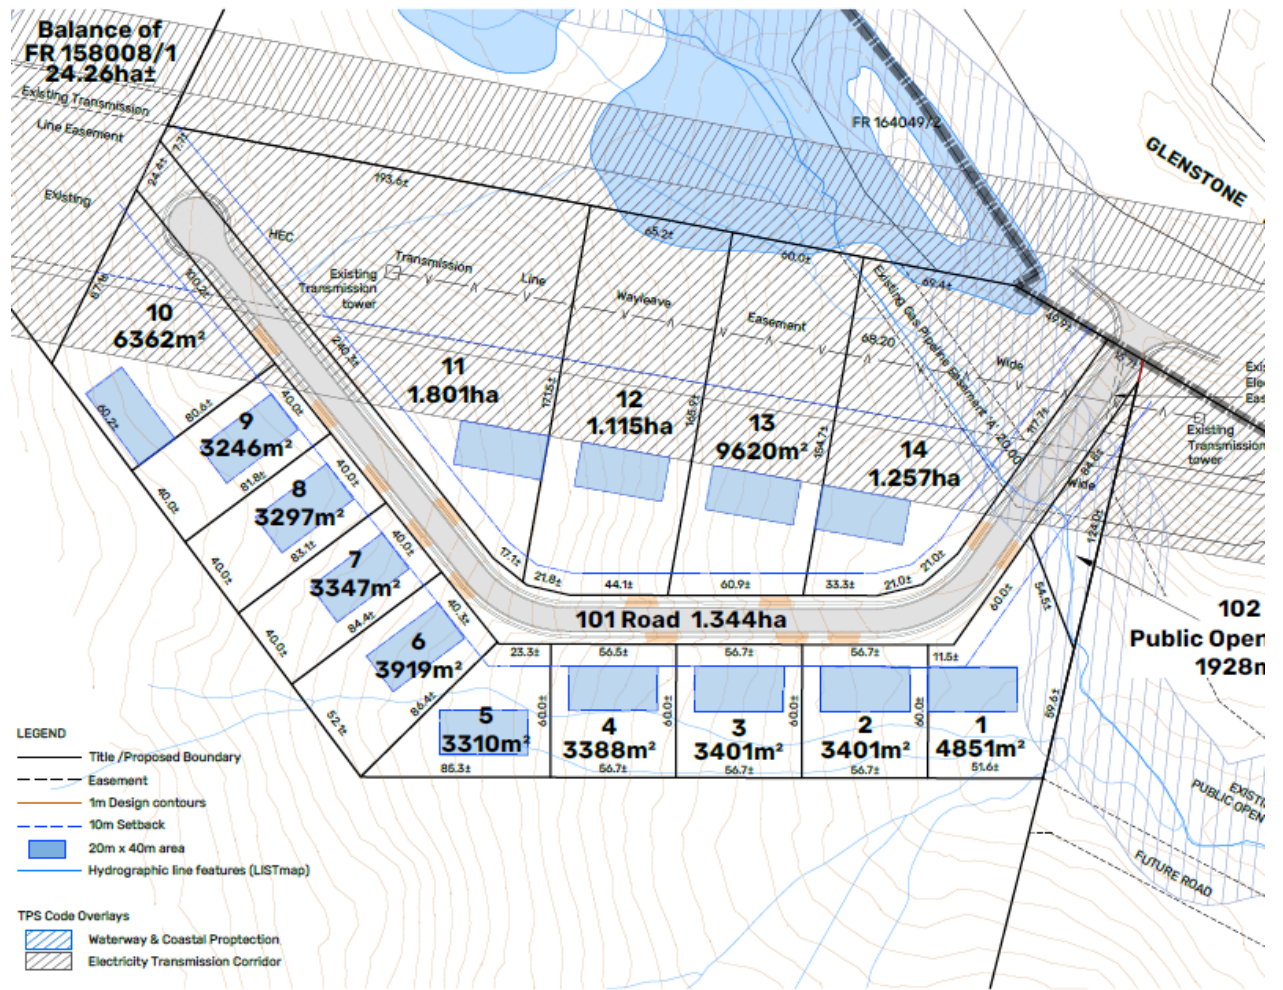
Proposed subdivision layout at 155 Cobbs Hill Road, Bridgewater
